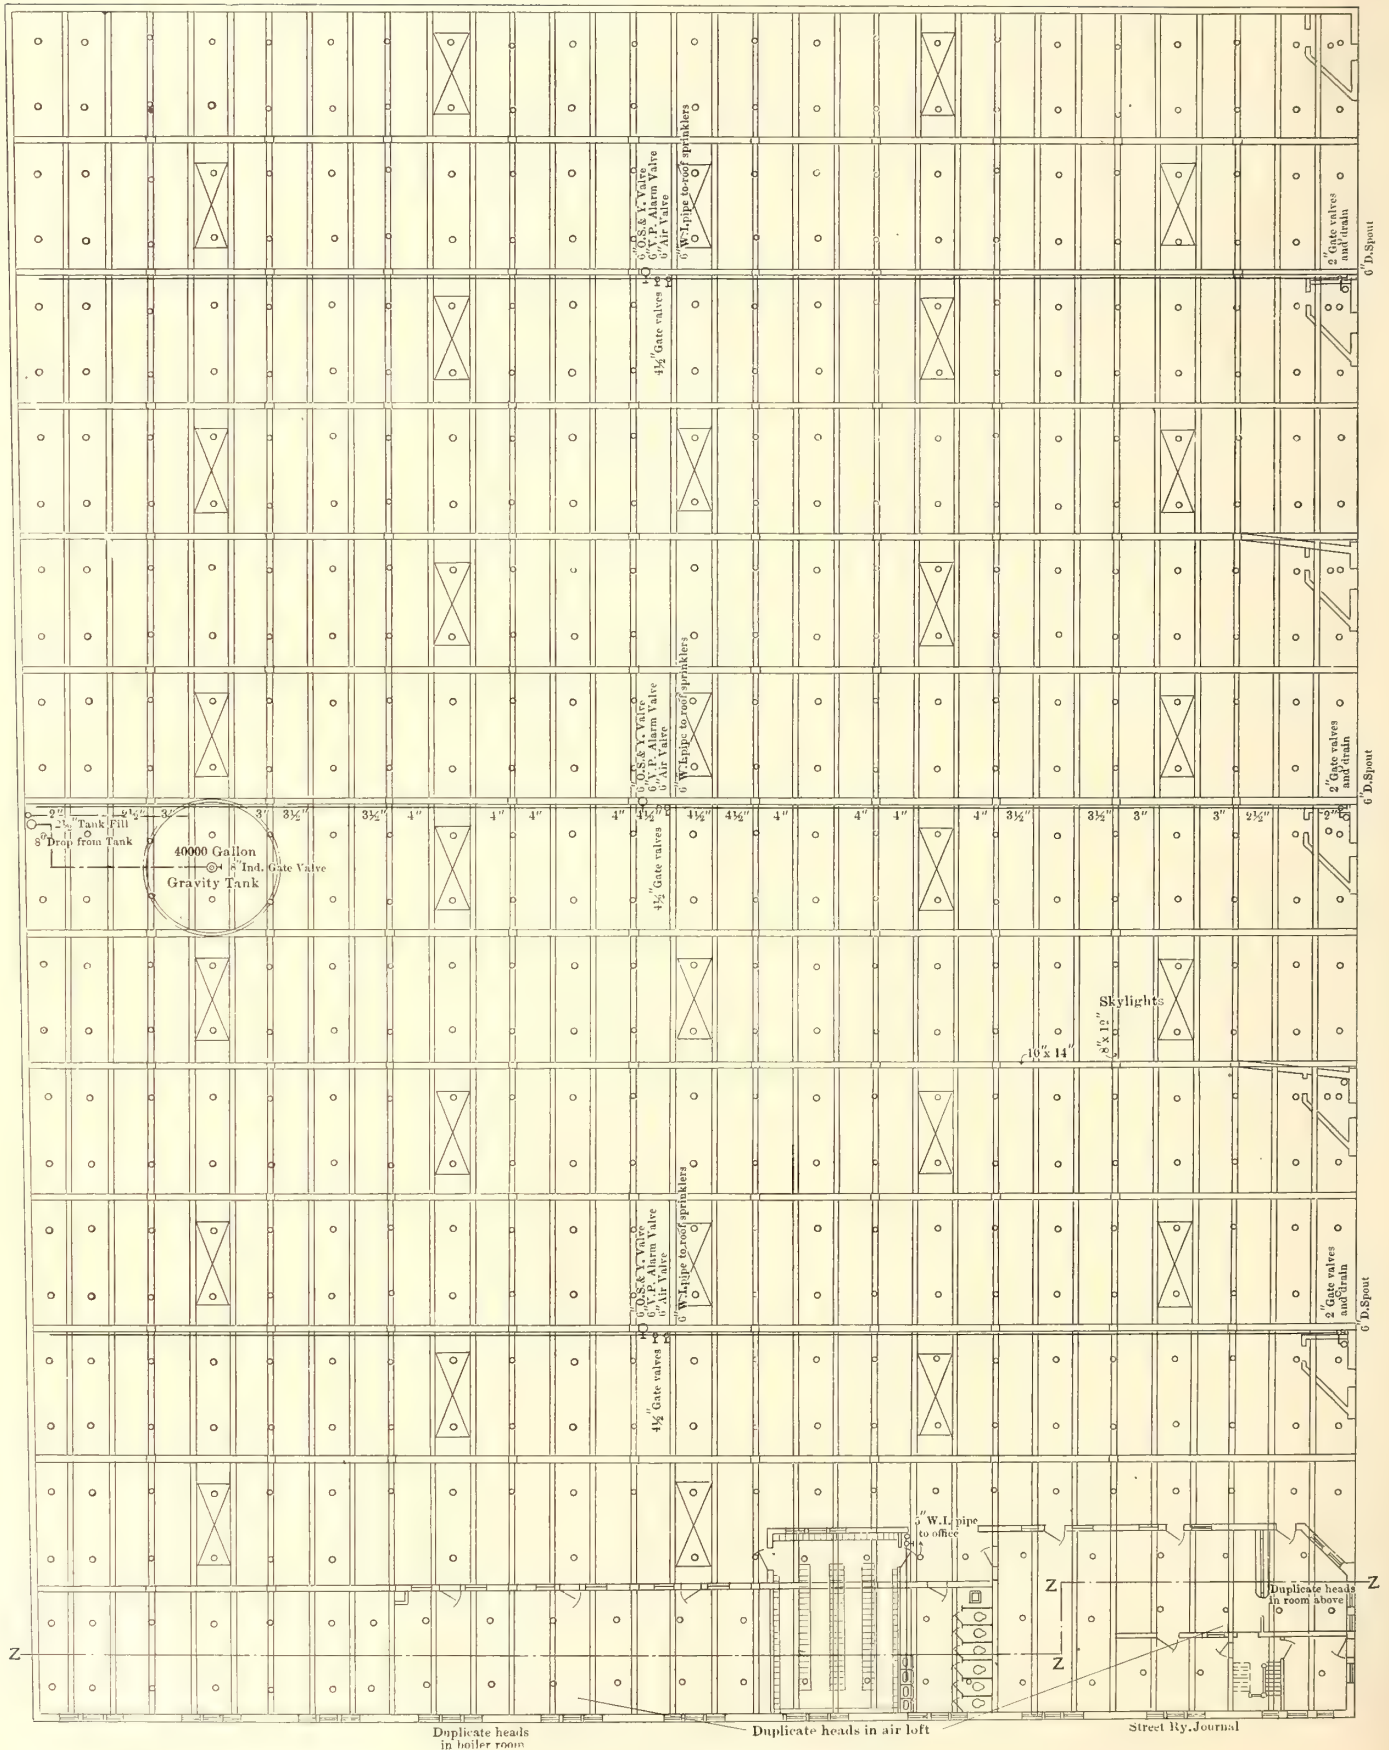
PLAN OF EDMONDSON AVENUE CAR HOUSE, SHOWING LOCATION OF ROOF SPRINKLERS
